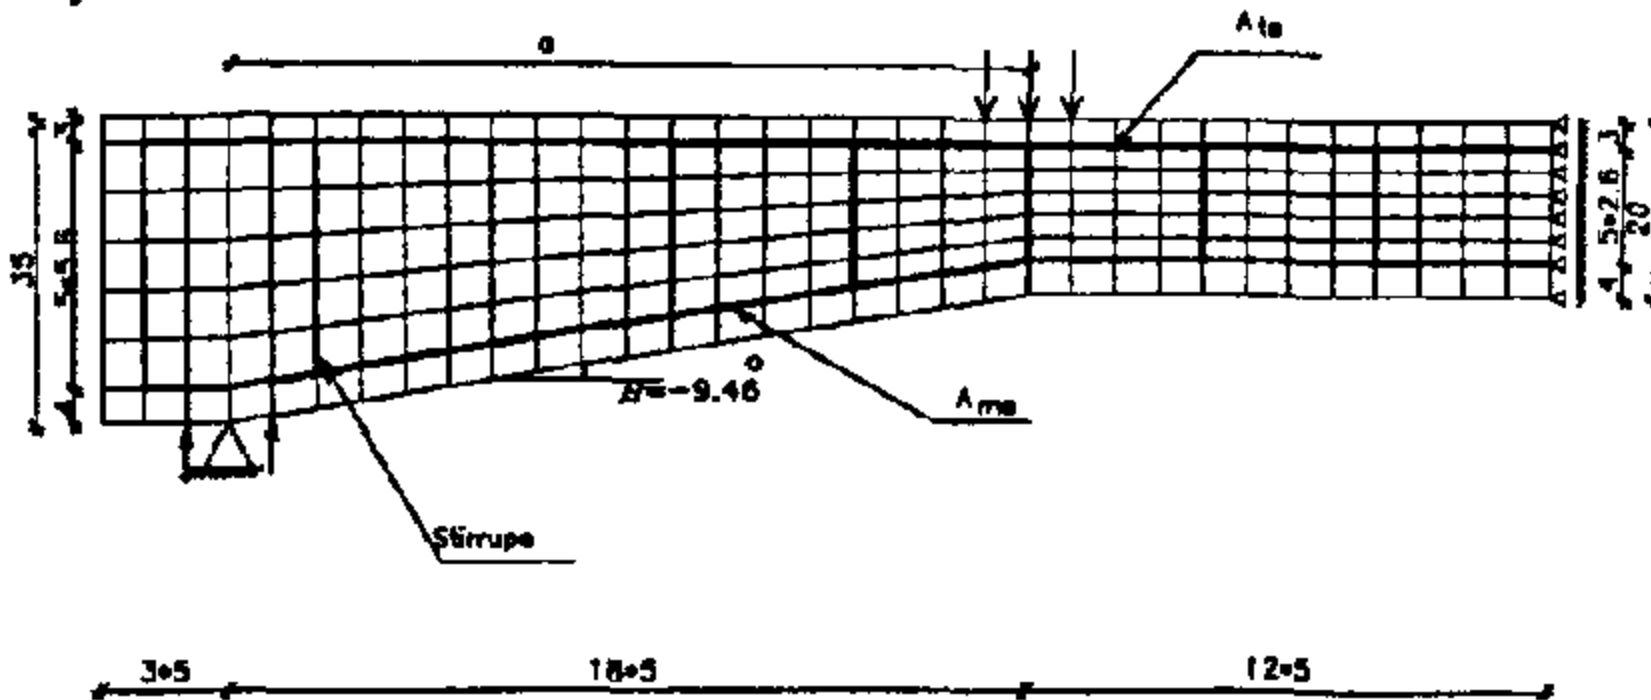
Finite element discretization for beams A1, B1, C1, D1, E1, F1, and G1
